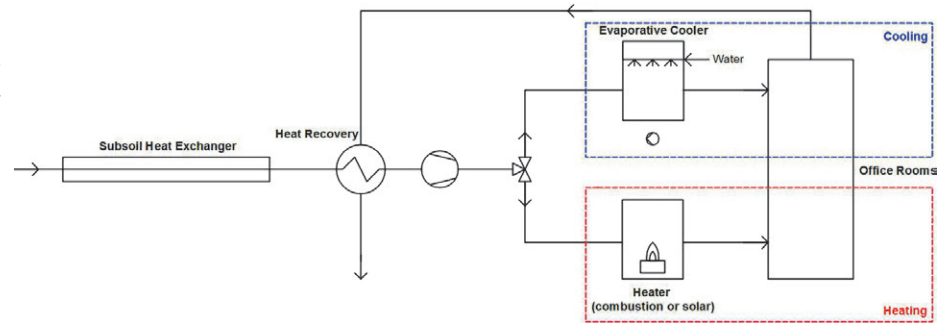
Heating and cooling systems in the New Generation Office Building with an air-to-air and subsoil heat exchanger | Fig. 126: Evaporative cooling system in the New Generation Office Building with an air-to-air and subsoil heat exchanger
